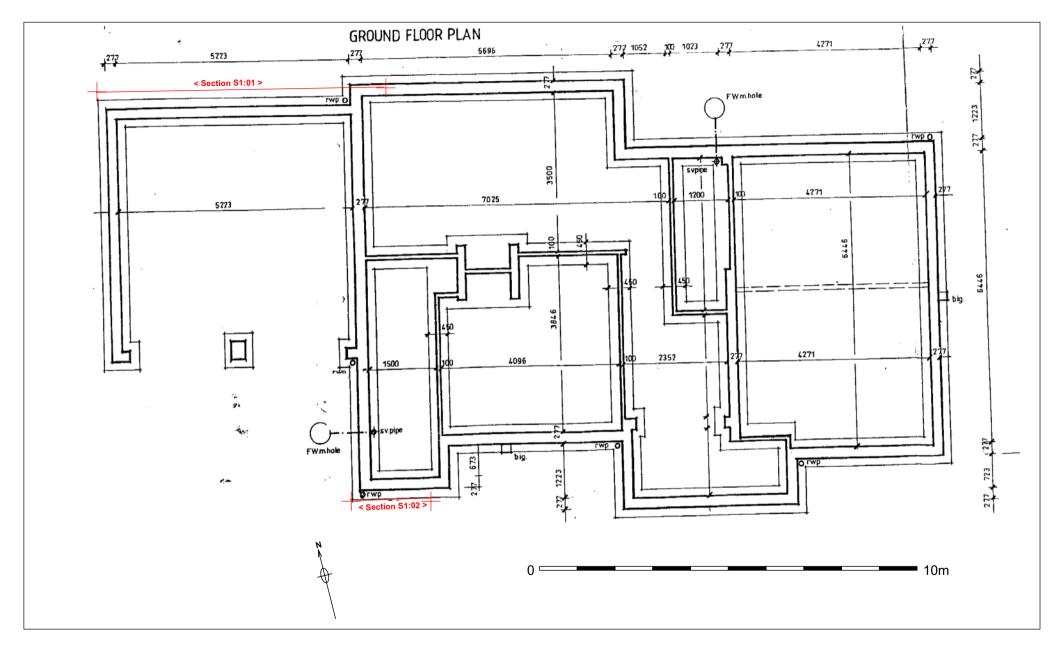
Architects plan showing foundation plan and location of sections S1:01 and S1:02 Scale 1:100
